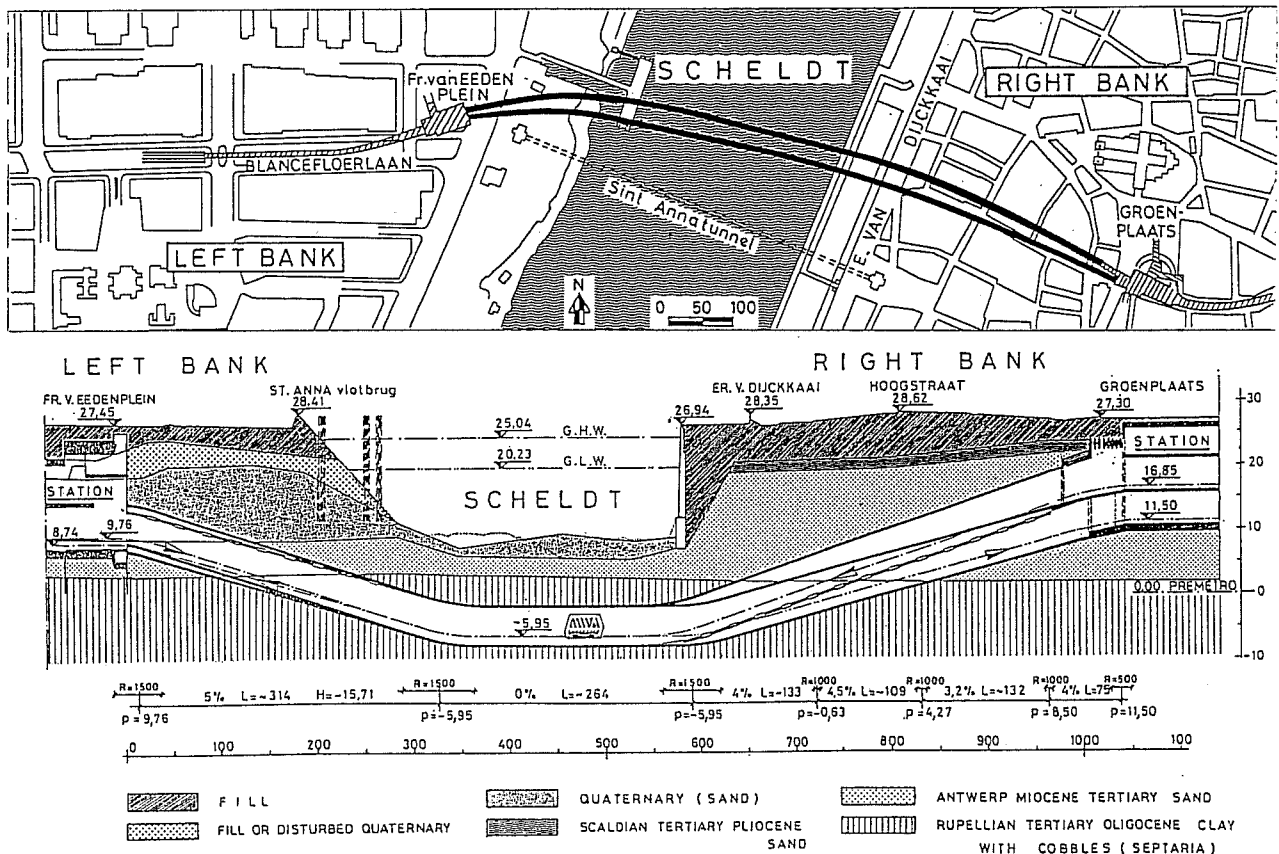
Location and vertical alignment of the new PREMETRO tunnel / Longitudinal geological section
